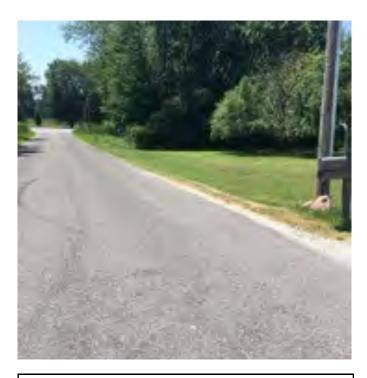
Facing south — view of CR 27 south of U.S. 20.
